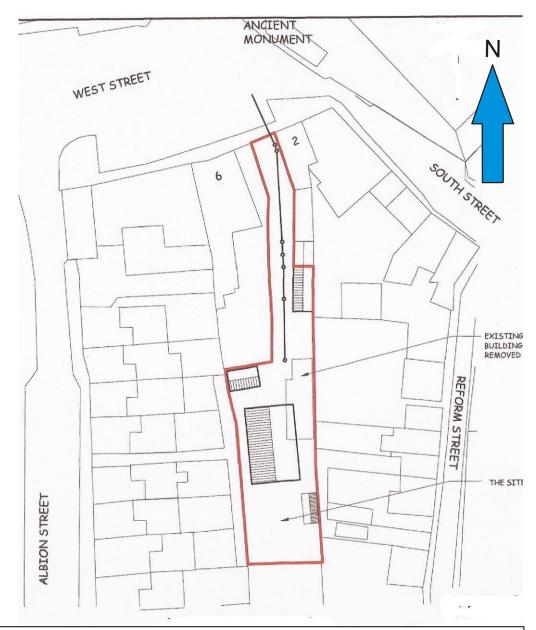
Block plan showing the proposed layout of the development site at an original scale of 1:500 at A3, (extract from Architects plan)
